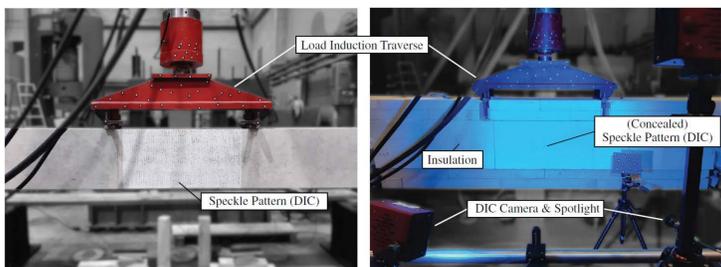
Photos of beams during mechanical and thermo-mechanical testing
